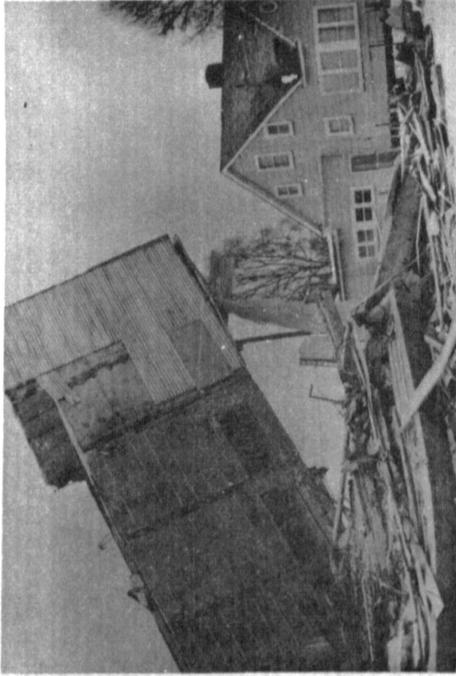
One of two toppled core towers at the Four Seasons Apartment Building.
